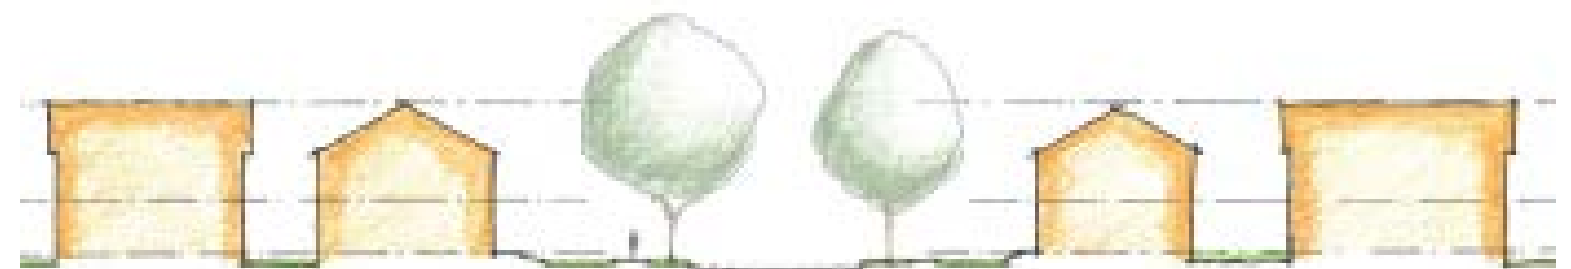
Cross-street section. Note that both houses shown have their front entries on the cross-street.
